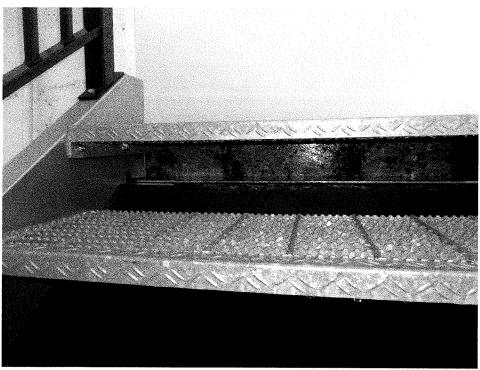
Parkade – Roof Level - New exterior roof stair showing steel corrosion atop the existing concrete at the top of the stair.
